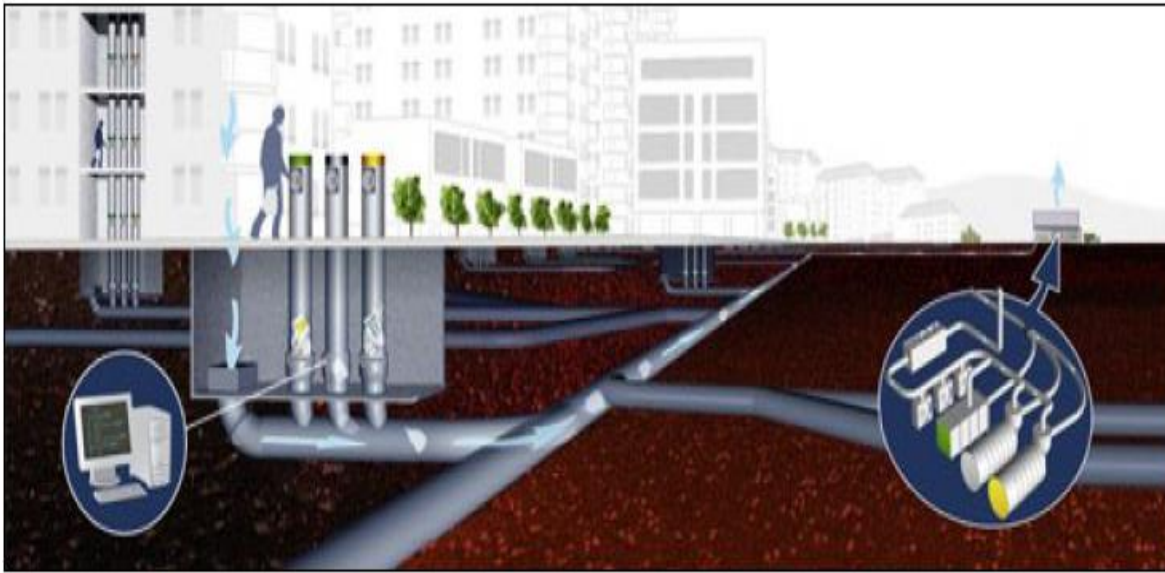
8 *Indore and outdoor underground waste disposal system
